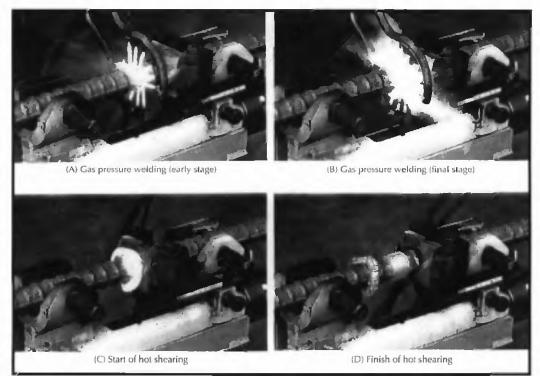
Gas pressure welding and hot shearing procedures.
